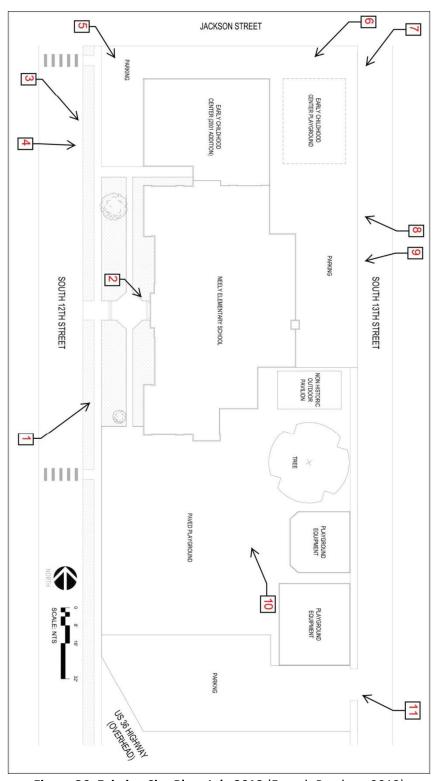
Existing Site Plan, July 2013 (Foutch Brothers 2013)
